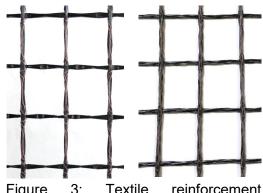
Textile reinforcement structure made of profiled rovings (left) and braiding yarns (right)
